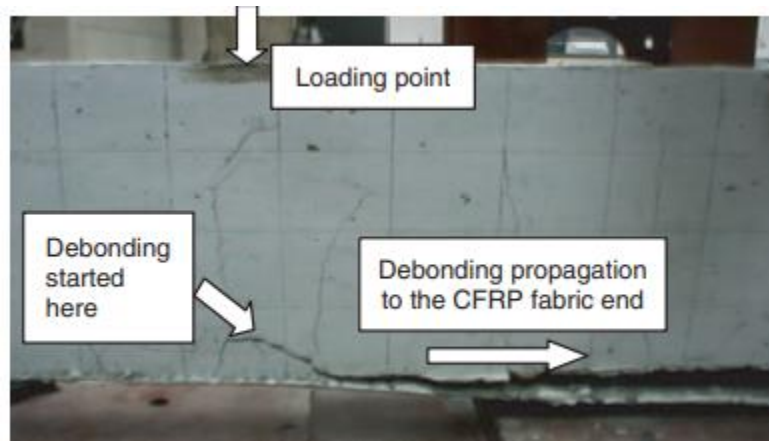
Debonding failure between FRP fabric and concrete, specimen B3. By: Zhao.
